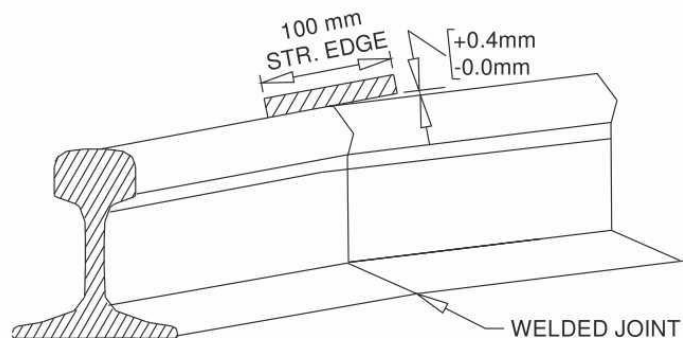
(d) Tolerance for Finishing Top Table Surface of a Welded Joint
